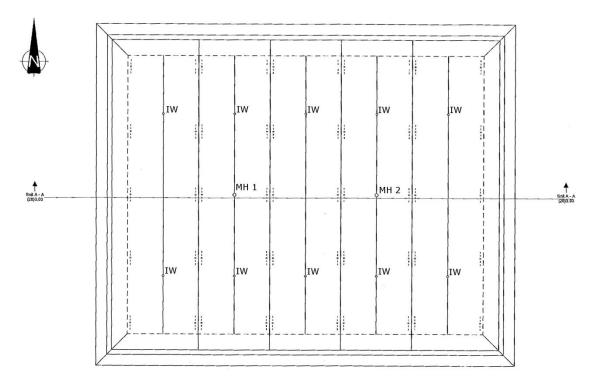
Top view. *MH=Manhole, IW=inspection well, --o-- = vacuum valve w. perforated tubes into the Leca layer. LECA-solution (Ref. 2)
